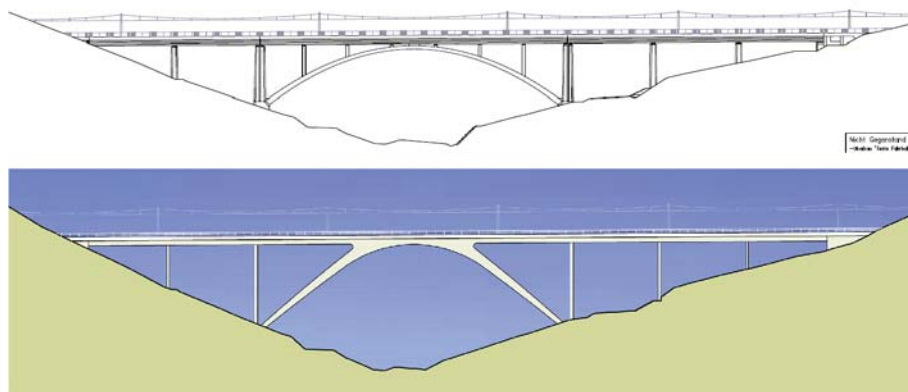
Deutsche Bahn's reference design for Grubental bridge; Schlaich Bergermann und Partner's alternative design concept.
